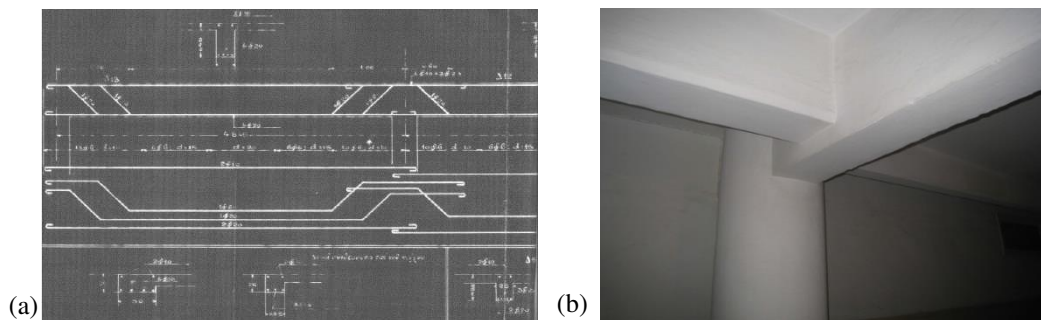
(a) Beam reinforcement detailing of the 1920s in Greece (original drawing); (b) Indirect support.
